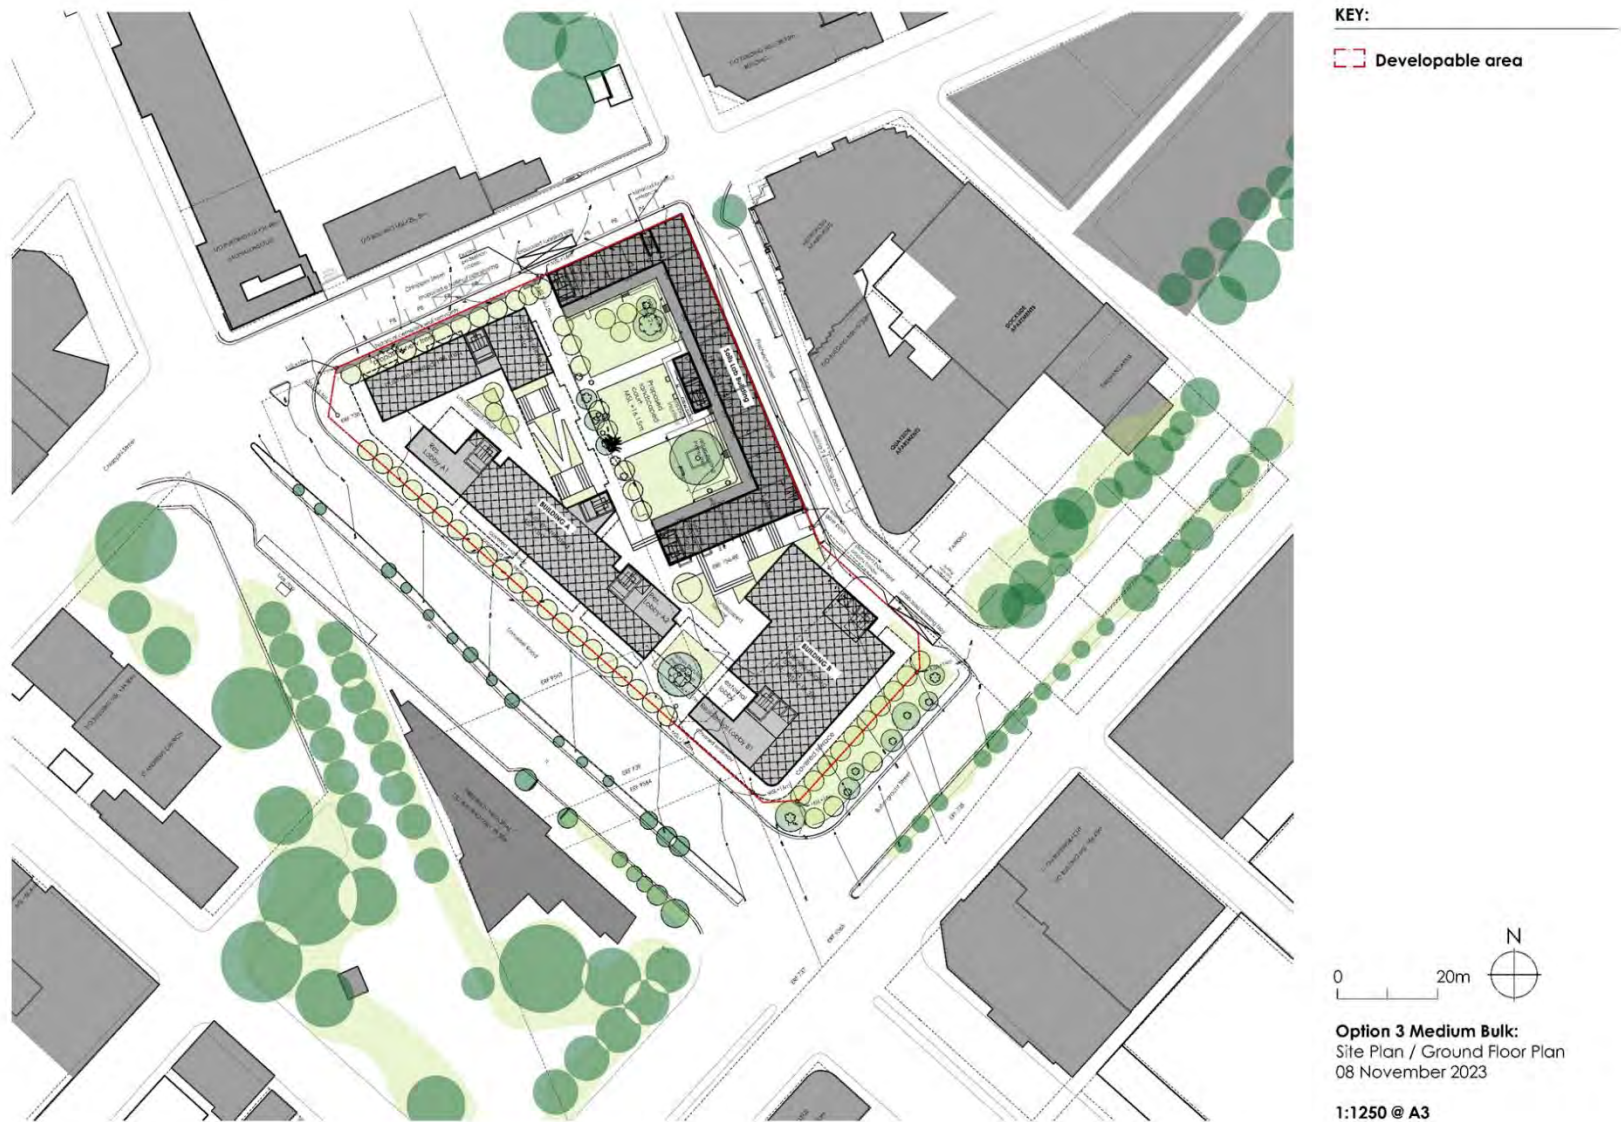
Conceptual Development Proposal Ground Floor Plan (Source: NM & Associates, 2023)
